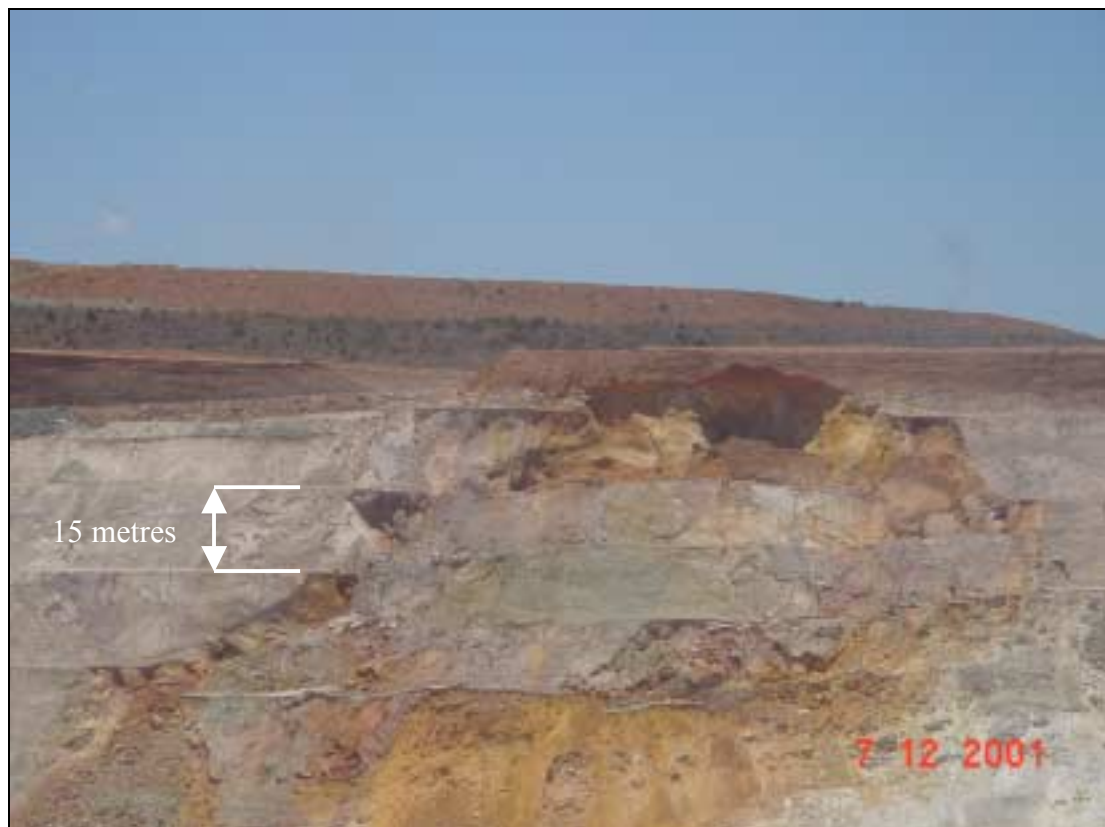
Mine wall failure at Mount Keith nickel mine – December 2001
